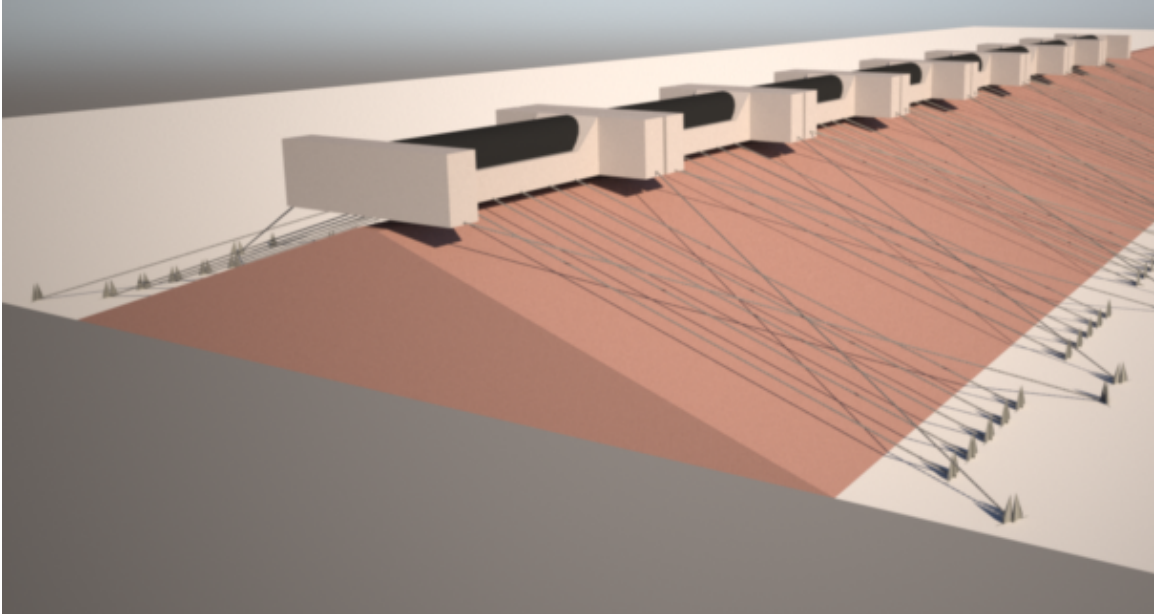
IMPRESSION DRAWING CROSS-SECTIONAL VIEW
